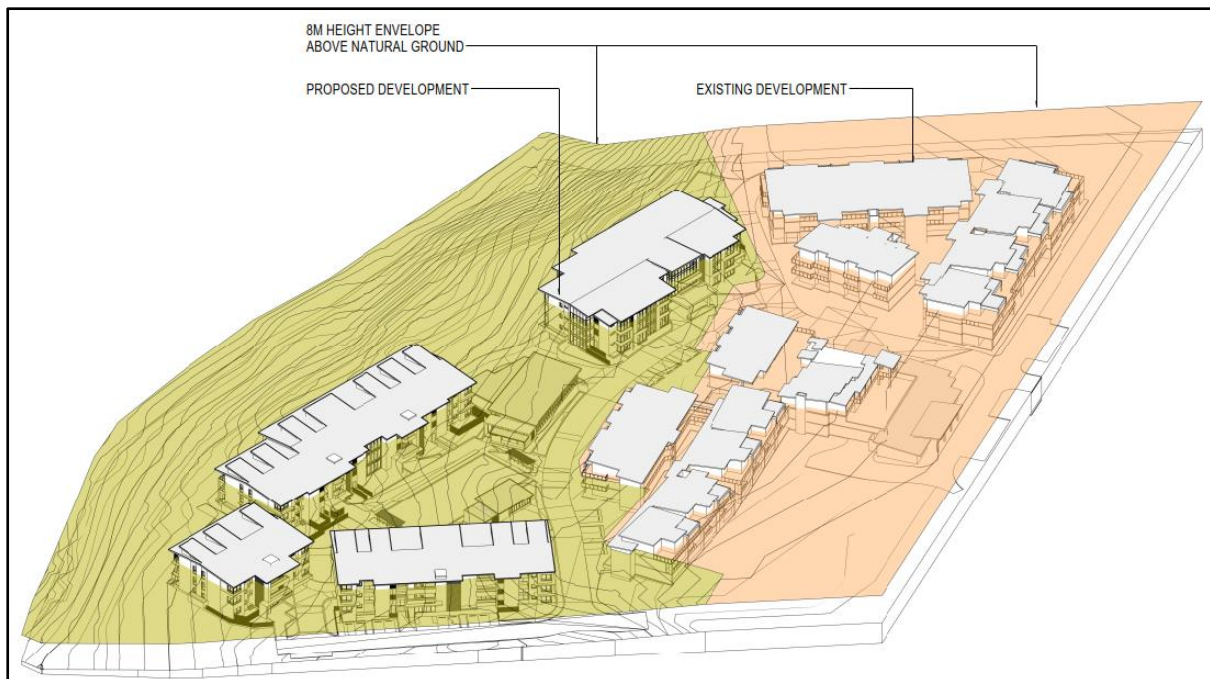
Aerial View – 8m Building Height Envelope (Source: Arqus Design)
